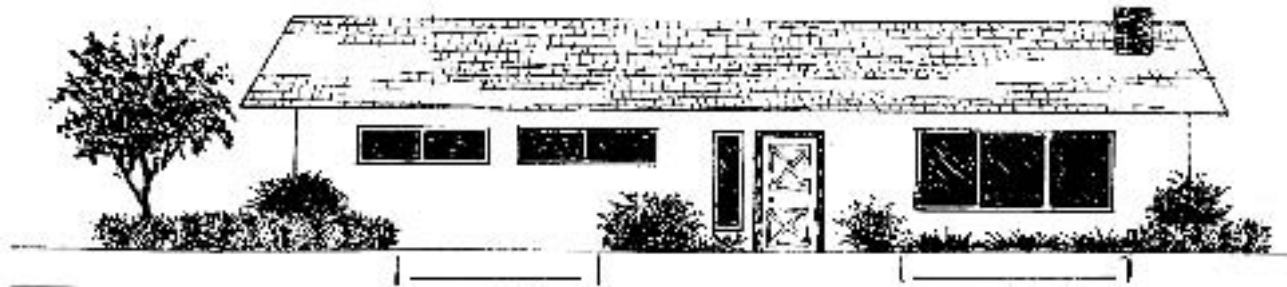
Shrubs, trees and other plantings can hide exposed concrete foundation and soften transition areas.
